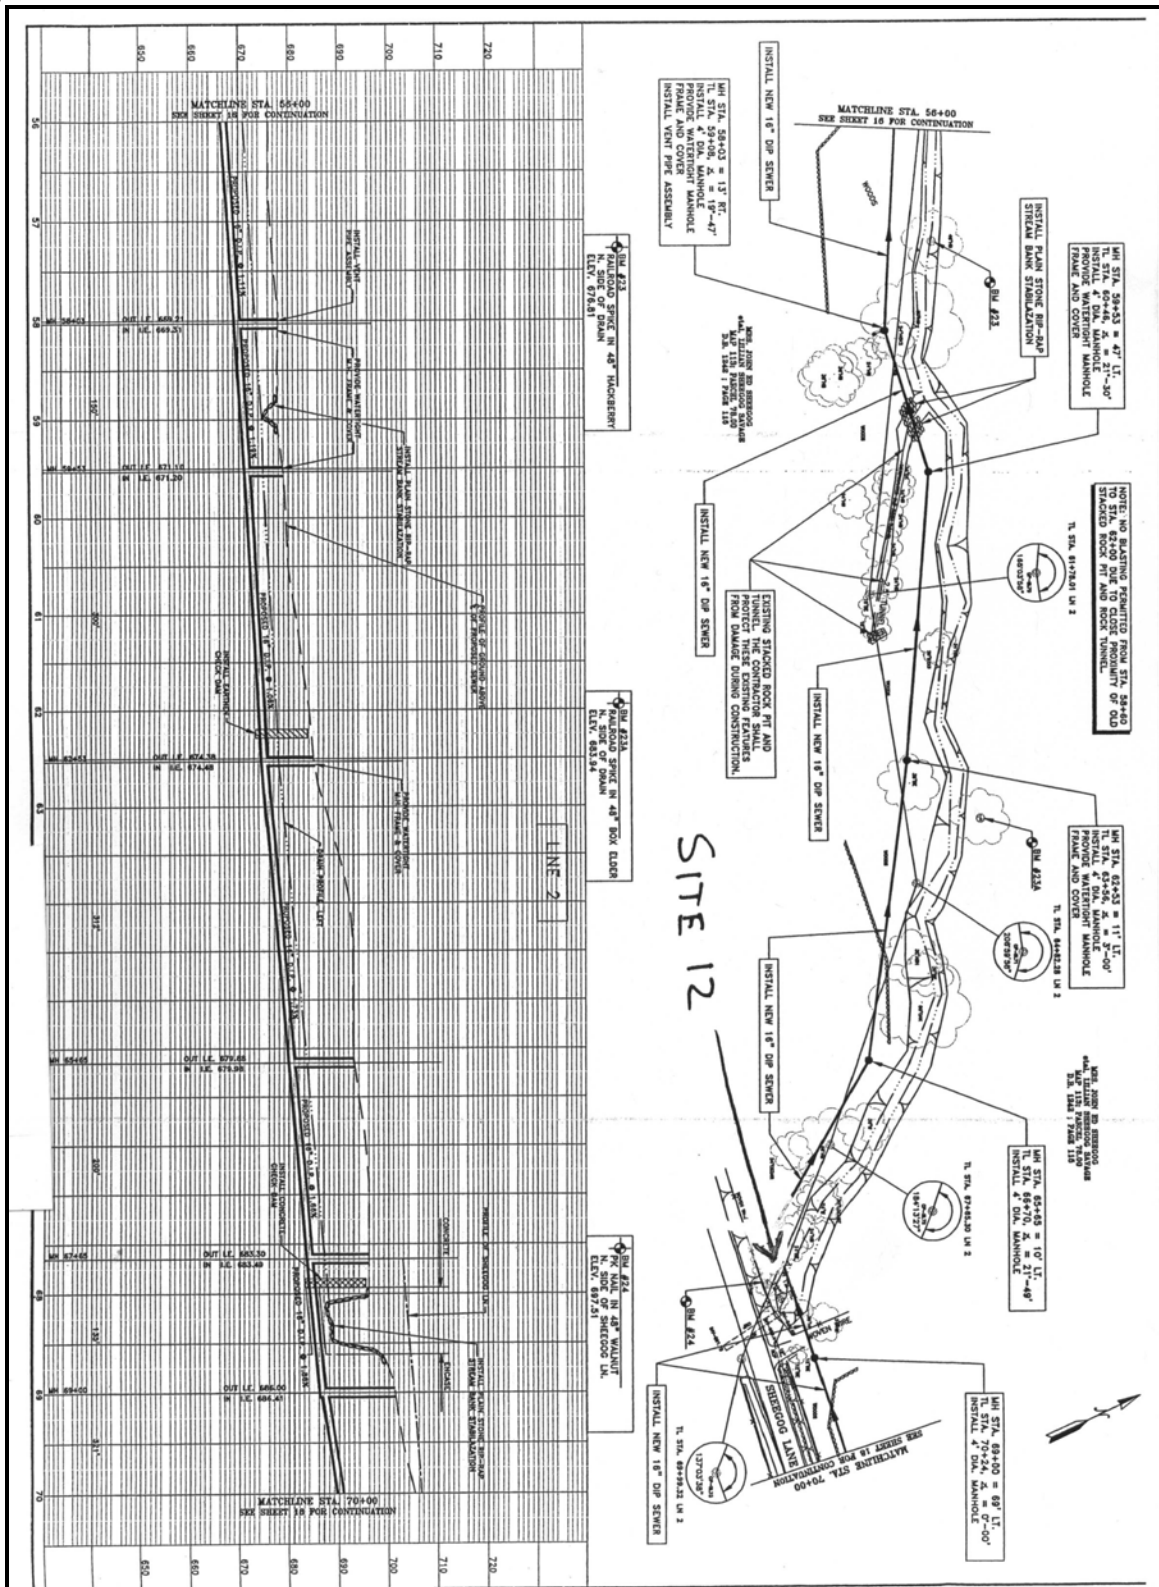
Plan sheet 17, site 12 on Unnamed tributary to Little Bigby (new crossing)
